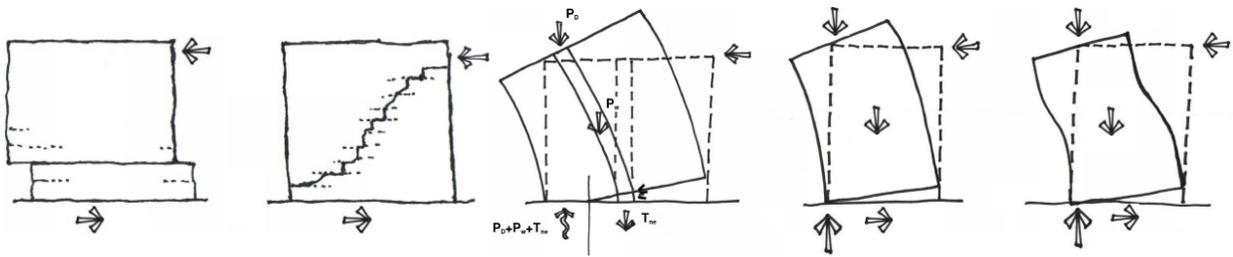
Masonry wall failure modes (left to right). Bed joint shear, diagonal shear mechanisms, flexure with toe crushing, rocking fixed-pin, and rocking fixed-fixed.
